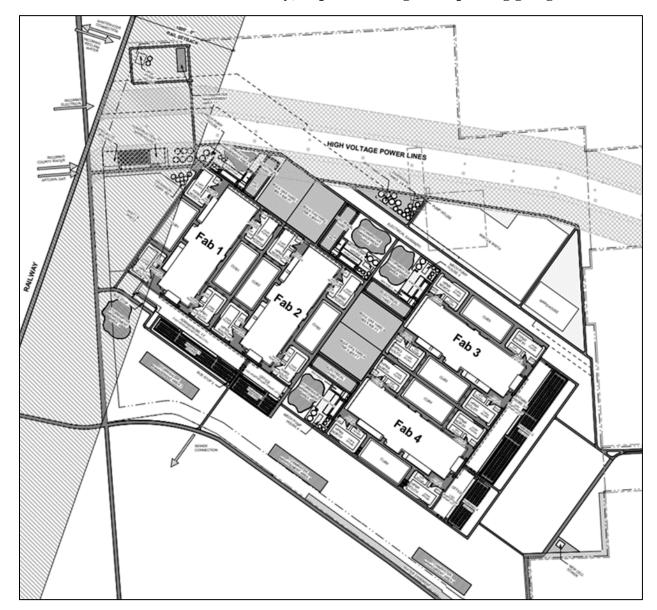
Site Layout Alternative 6 (Fabs 3-4 rotated horizontally; requires underground parking garages)
